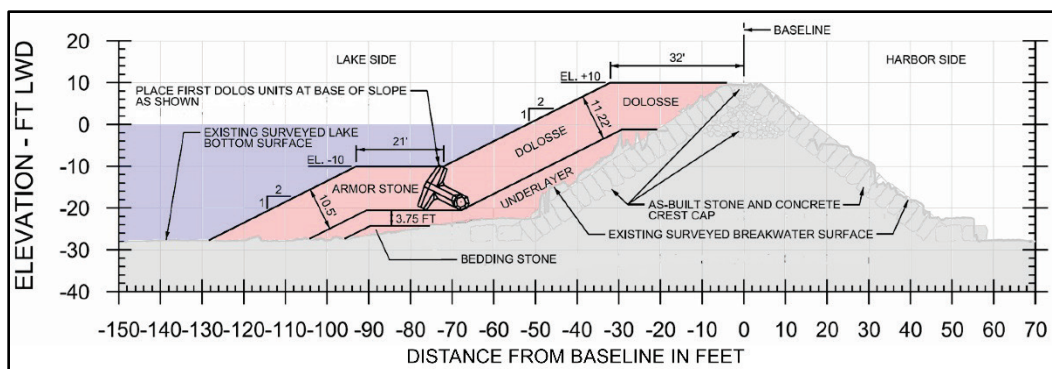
Oswego Detached Breakwater typical repair section with 16.0-ton dolosse.
